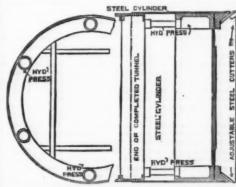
SECTION OF TUNNEL END AND SHIELD.
